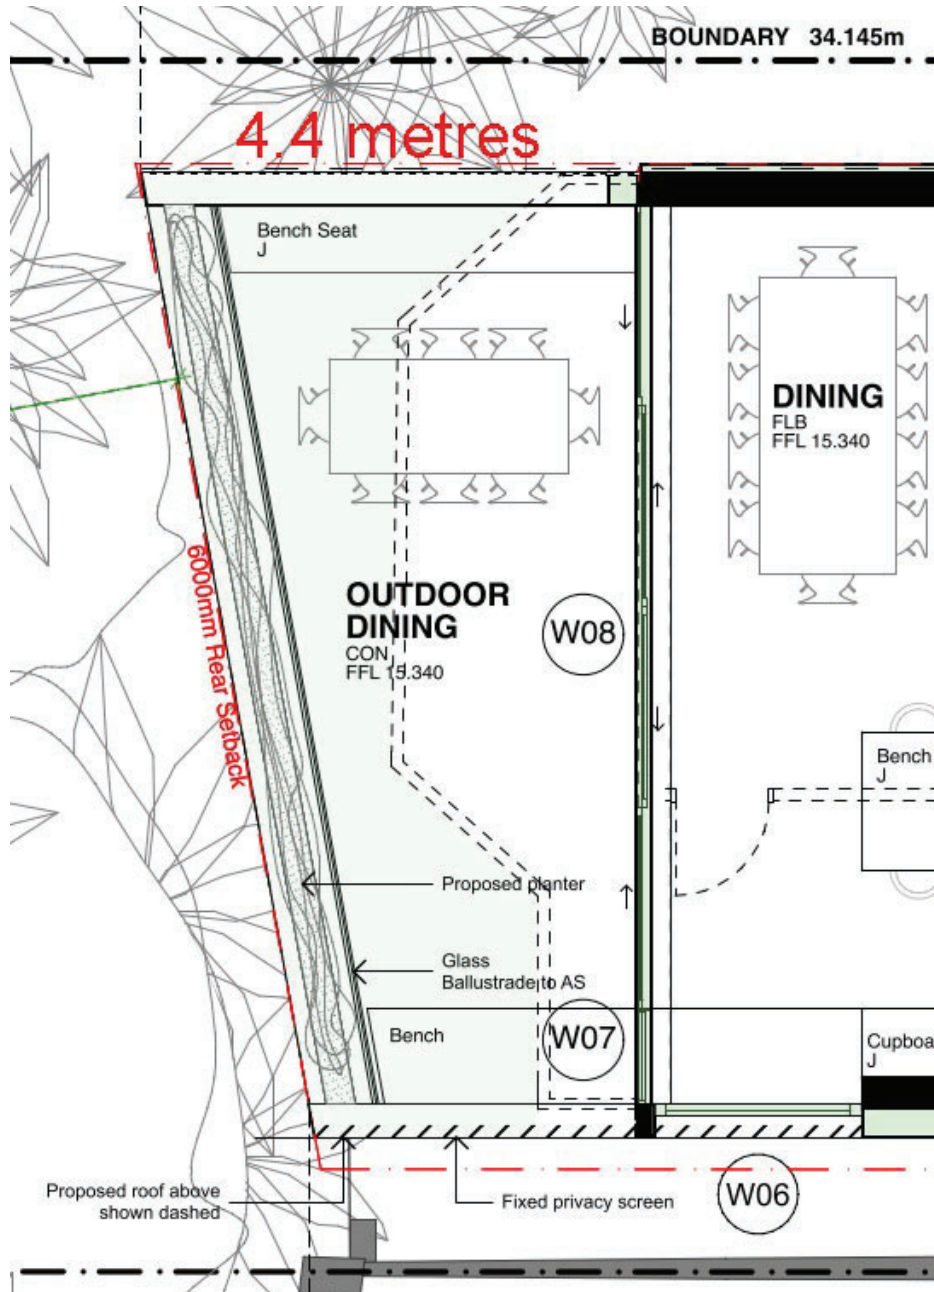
Extract from plan DA002, Rev. A, showing proposed rear balcony prior to amendments.
